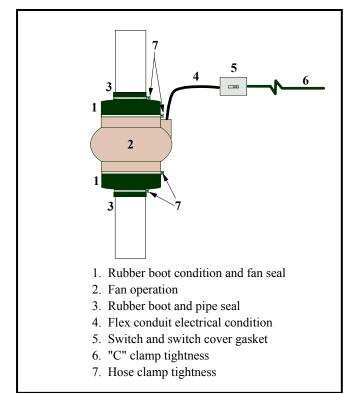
Components to inspect in an SSD system pipe-mounted fan assembly.
